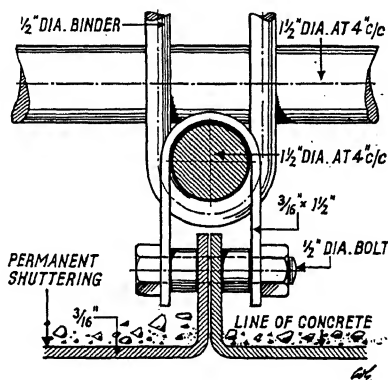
Showing details of permanent steel soffit shuttering attached to reinforcement.
